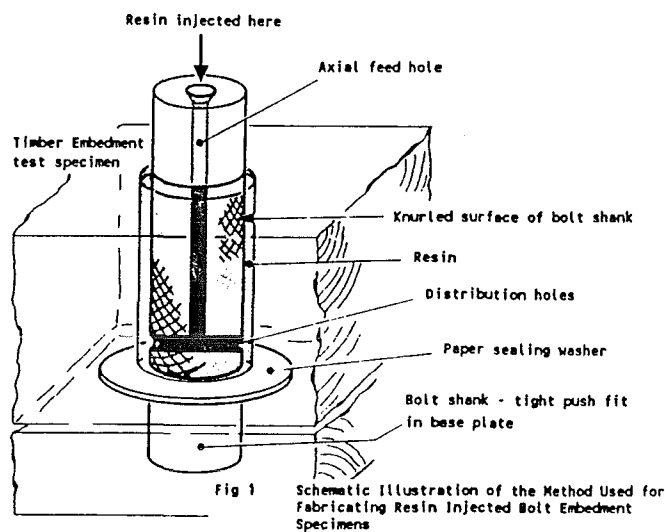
The method used to construct resin injected bolt specimens (Rodd, 1989)
